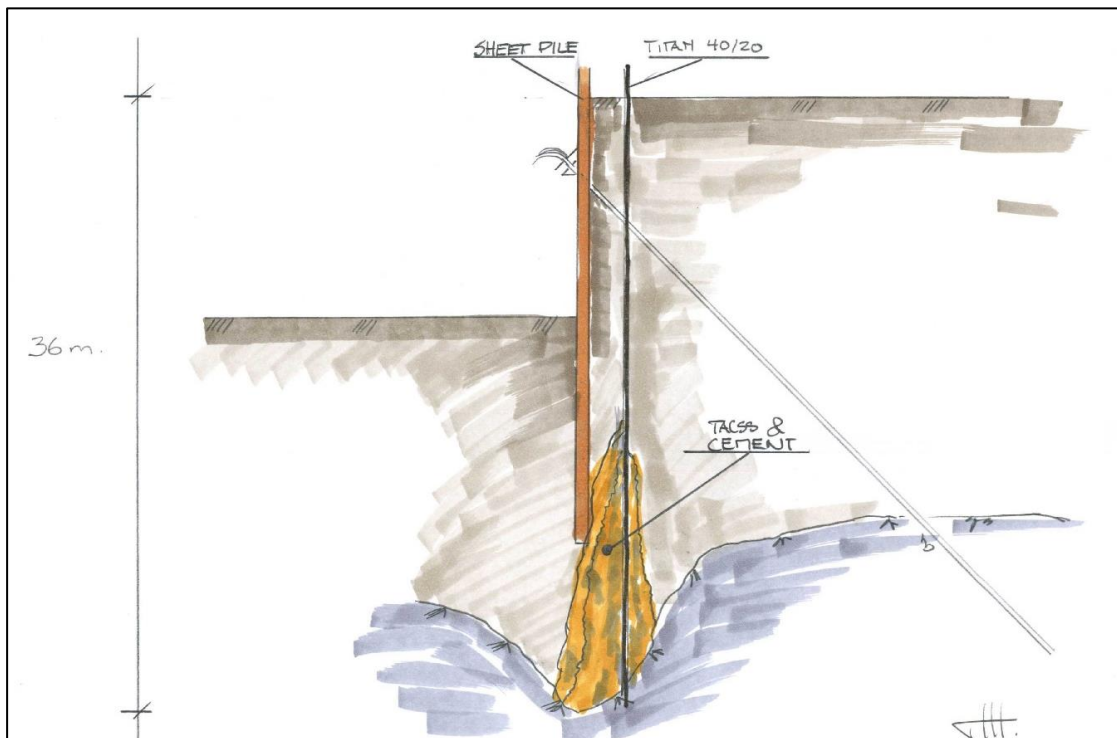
Typical profile of gap between the bedrock and the toe of the sheet pile wall
